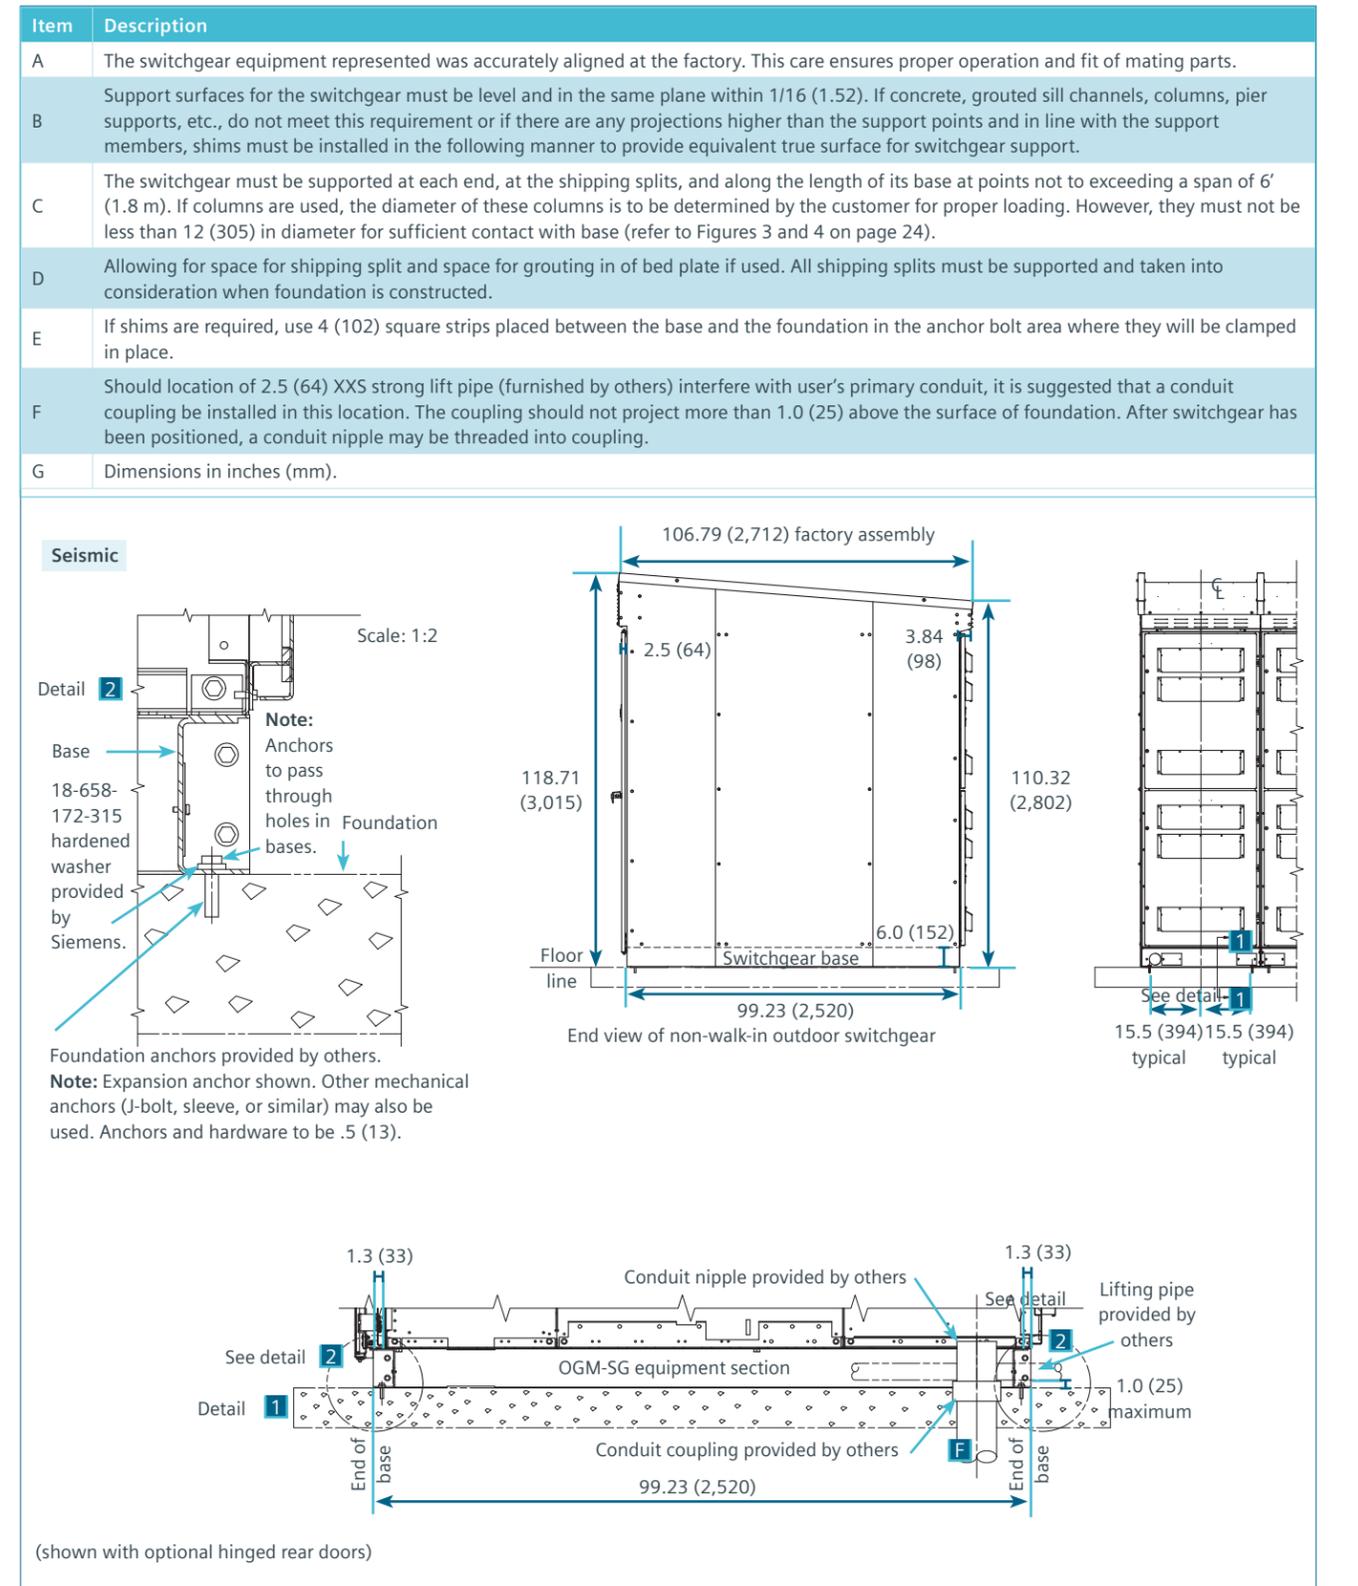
Anchoring outdoor type OGM-SG non-walk-in switchgear (continued)
